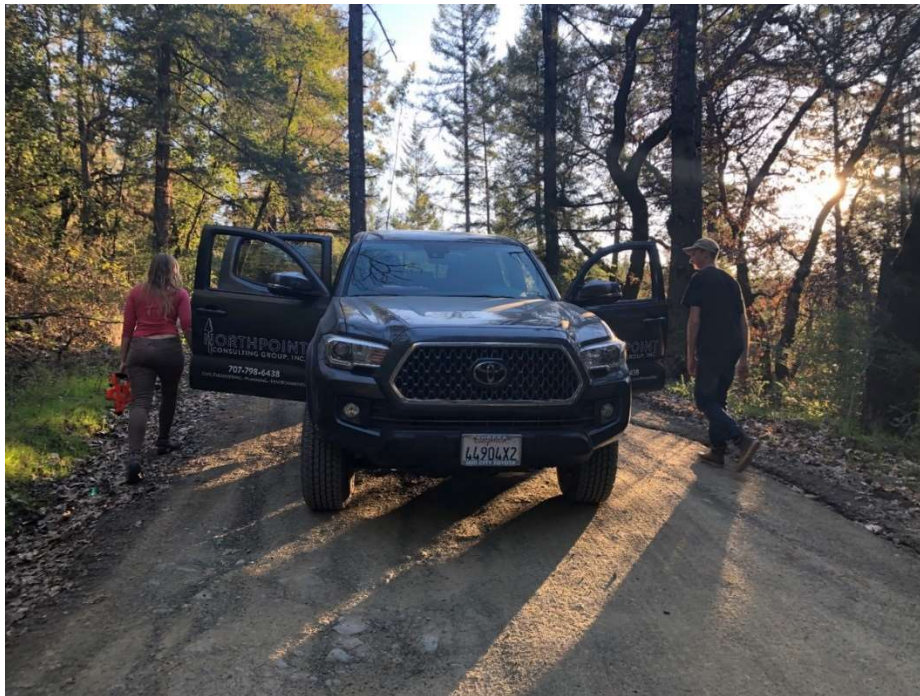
RP 5. 18-ft wide. Vehicle traveling north. Photo taken facing south. (40.082647°, -123.793770°)
